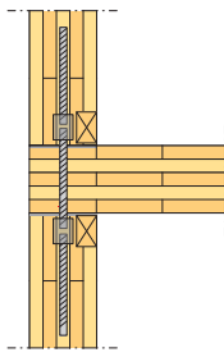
Joint between wall panels and floor slab using fully threaded screws and dowels.
